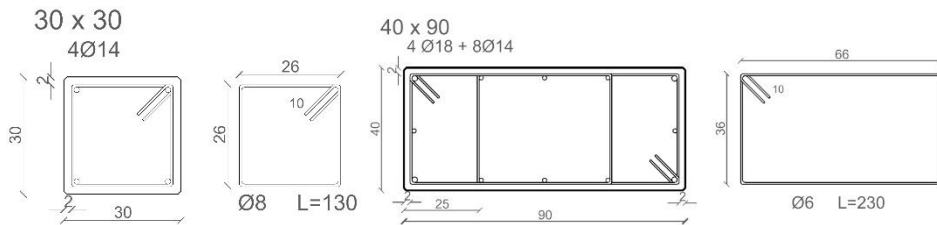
Concrete Column cross section and reinforcement layouts (section 30x30 and 40x80)
